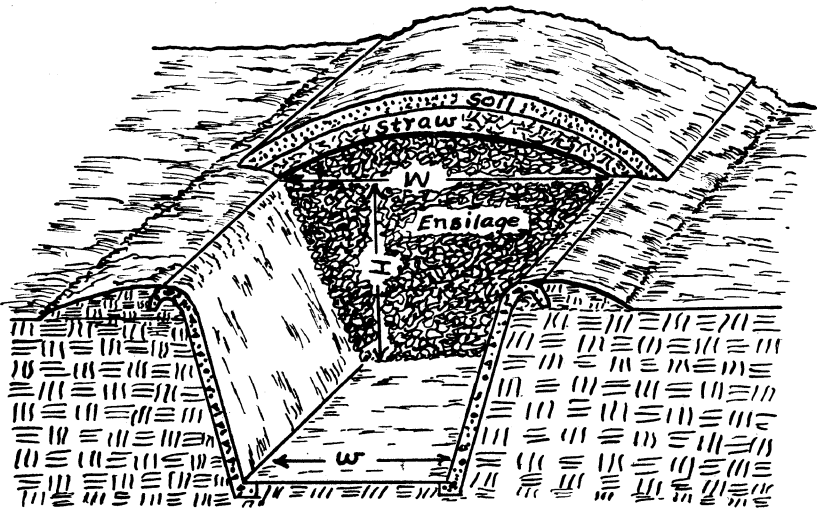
Cross-section of a trench silo, showing the concrete lining, foundation and method of covering the ensilage.
